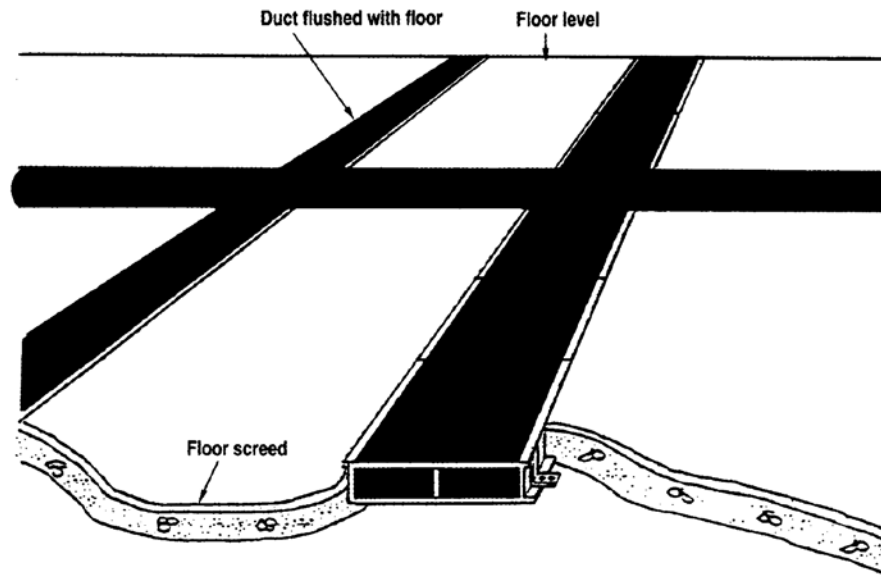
Under-floor duct extended to floor trench / flush trunking
